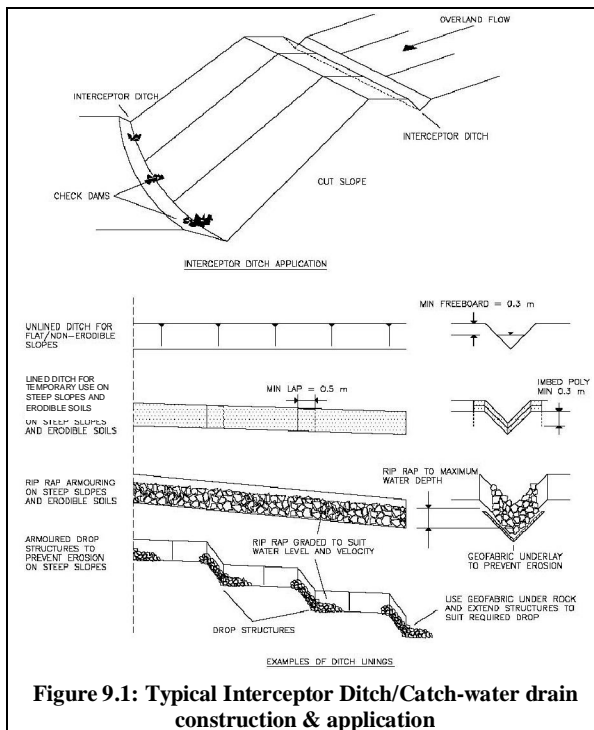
Typical Interceptor Ditch/Catch-water drain construction & application
